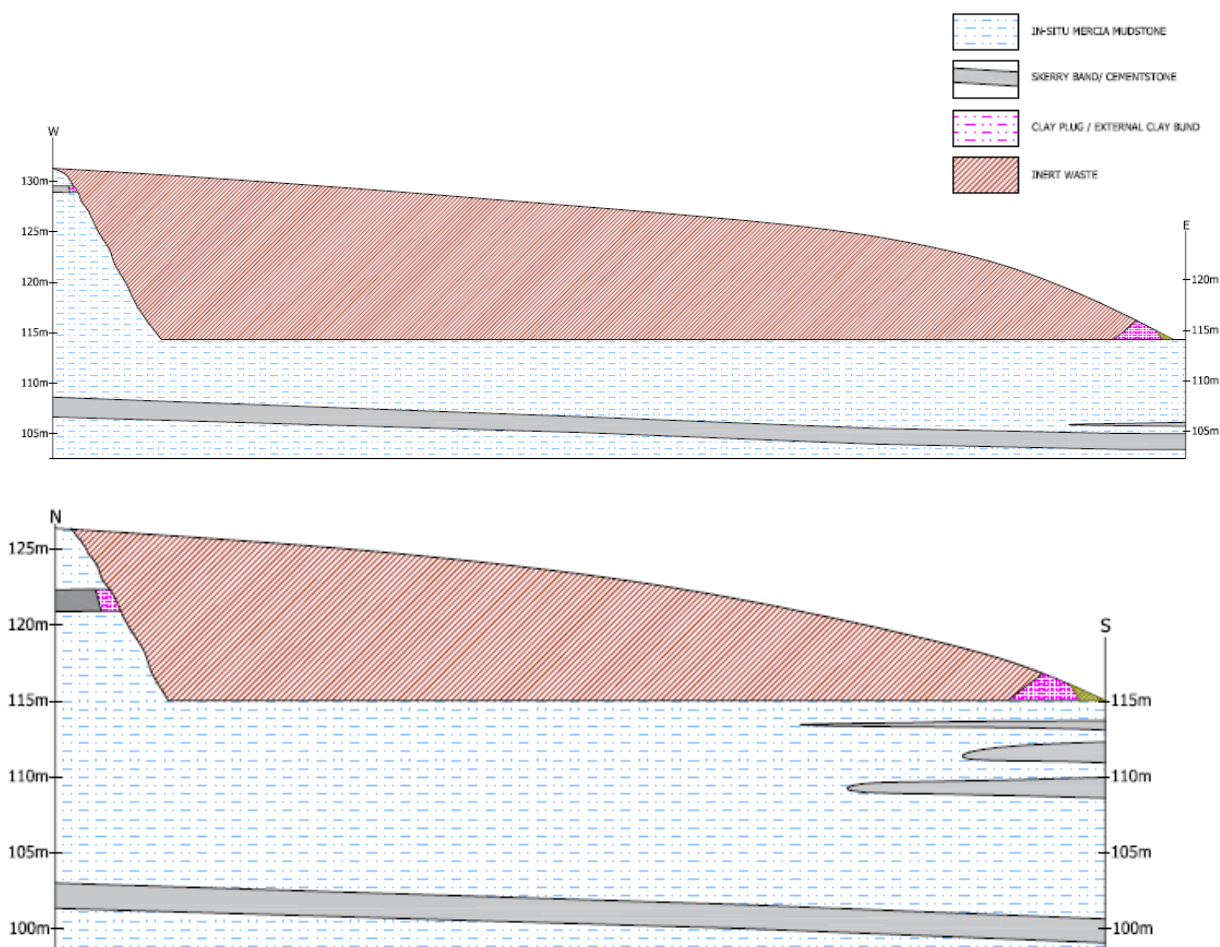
Geological Cross Sections showing proposed finished elevations (Drawing No. MGL/B027237/HYD/03)
